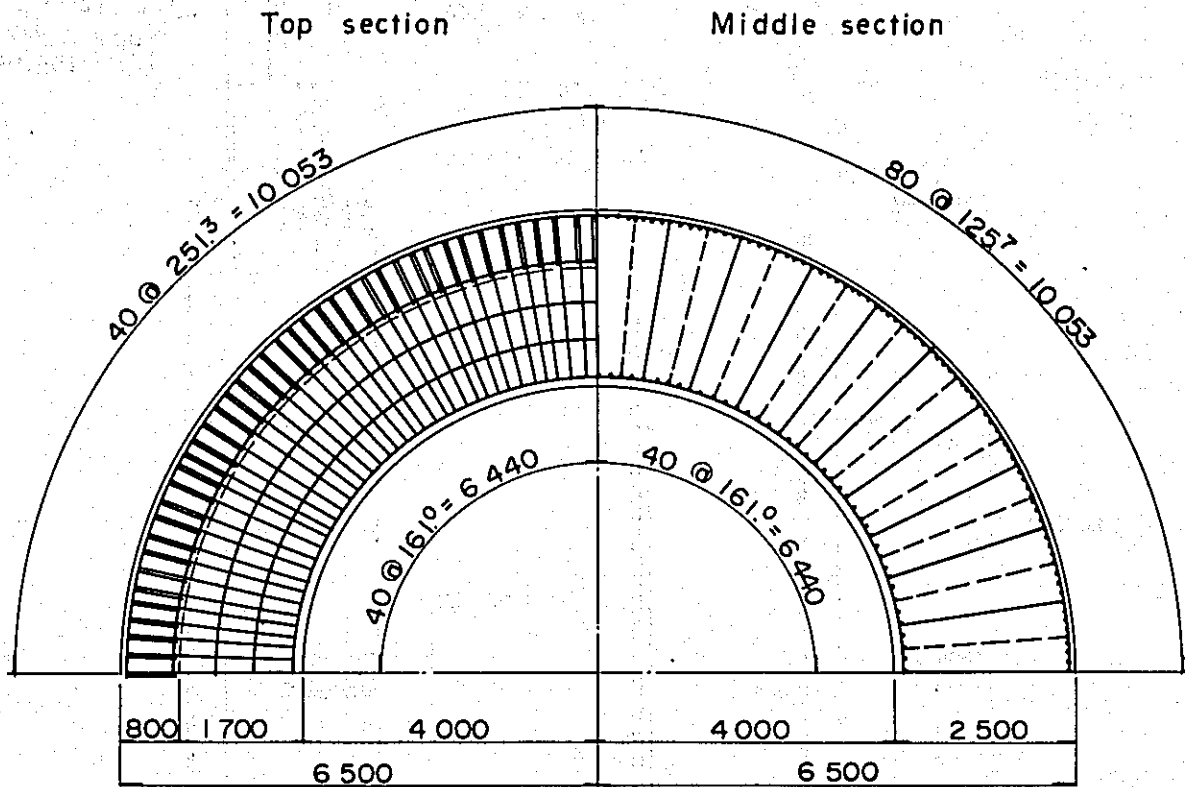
23-2 Arrangement of Reinforcing Bars of Wells (2)
